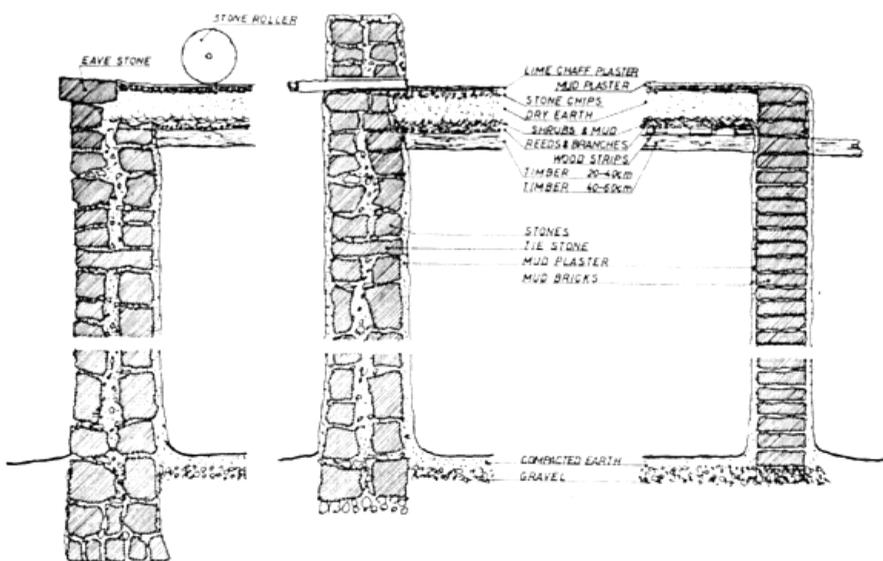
Detailed drawing for a traditional stone and mud brick wall with flat roof
